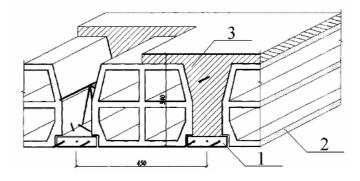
General arrangement of a composite precast and cast-in-situ slab "Dakh"
